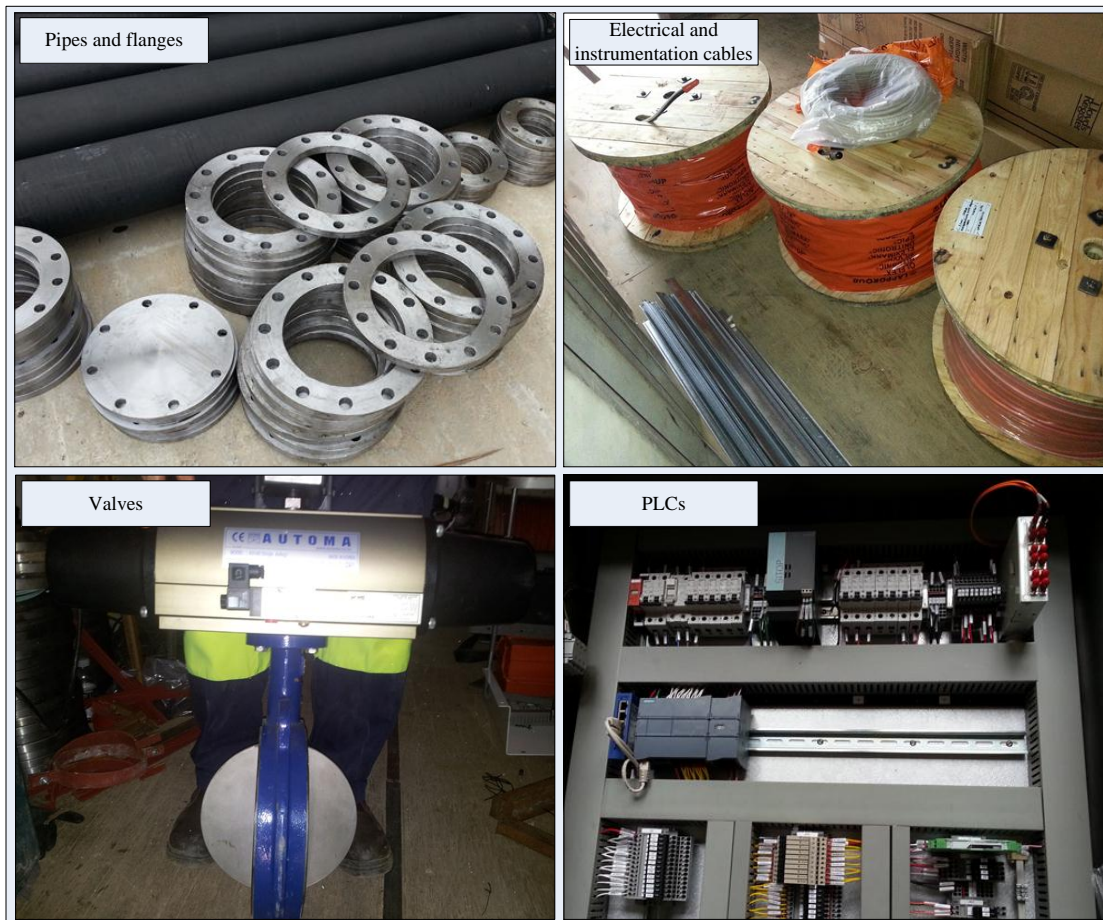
Typical equipment used in the modernisation and improvement project²⁰.
